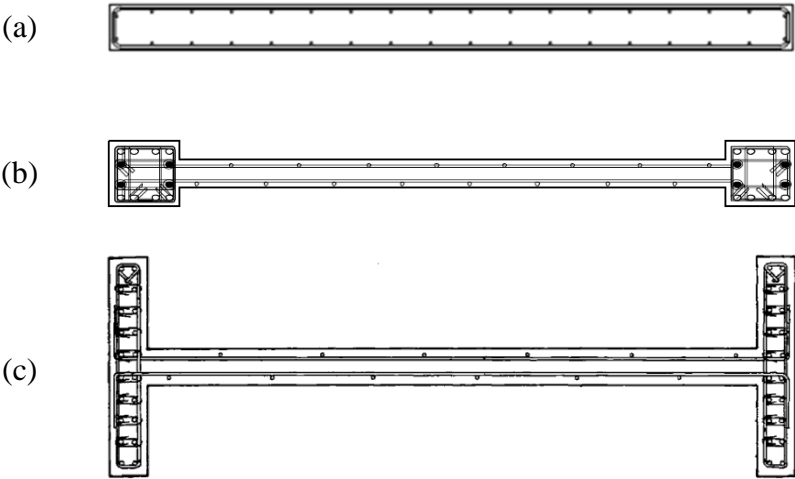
Typical wall cross sectional shapes: (a) rectangular cross section (adapted from Whyte and Stojadinovic, 2013); (b) barbell cross section (adapted from Matsui et al., 2004); (c) flanged cross section (adapted from Barda, 1972).
